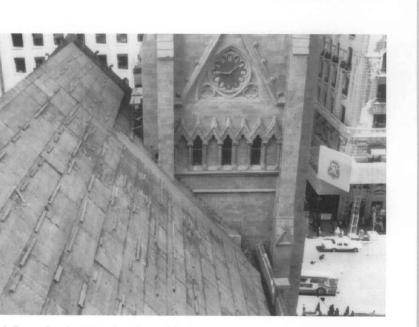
Dropped equipment, tools, and materials all present risks when new construction rises above neighboring historic structures. In this case, the historic slate roof was completely covered with sheets of exterior grade plywood. Photo: National Park Service files.
